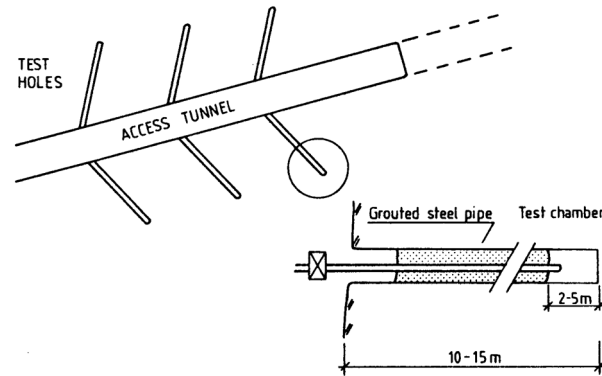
Typical arrangement of hydrofracture test holes and hole detail
